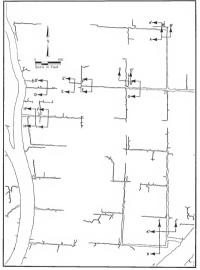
Section A-A' through K-K' surveyed cross-section locations.
